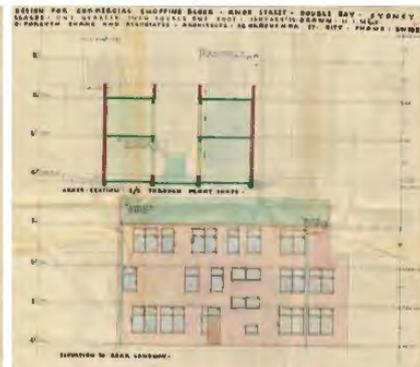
Evan's Knox Lane elevation and section of the proposed "shopping block" at No 21 Bay Street.
